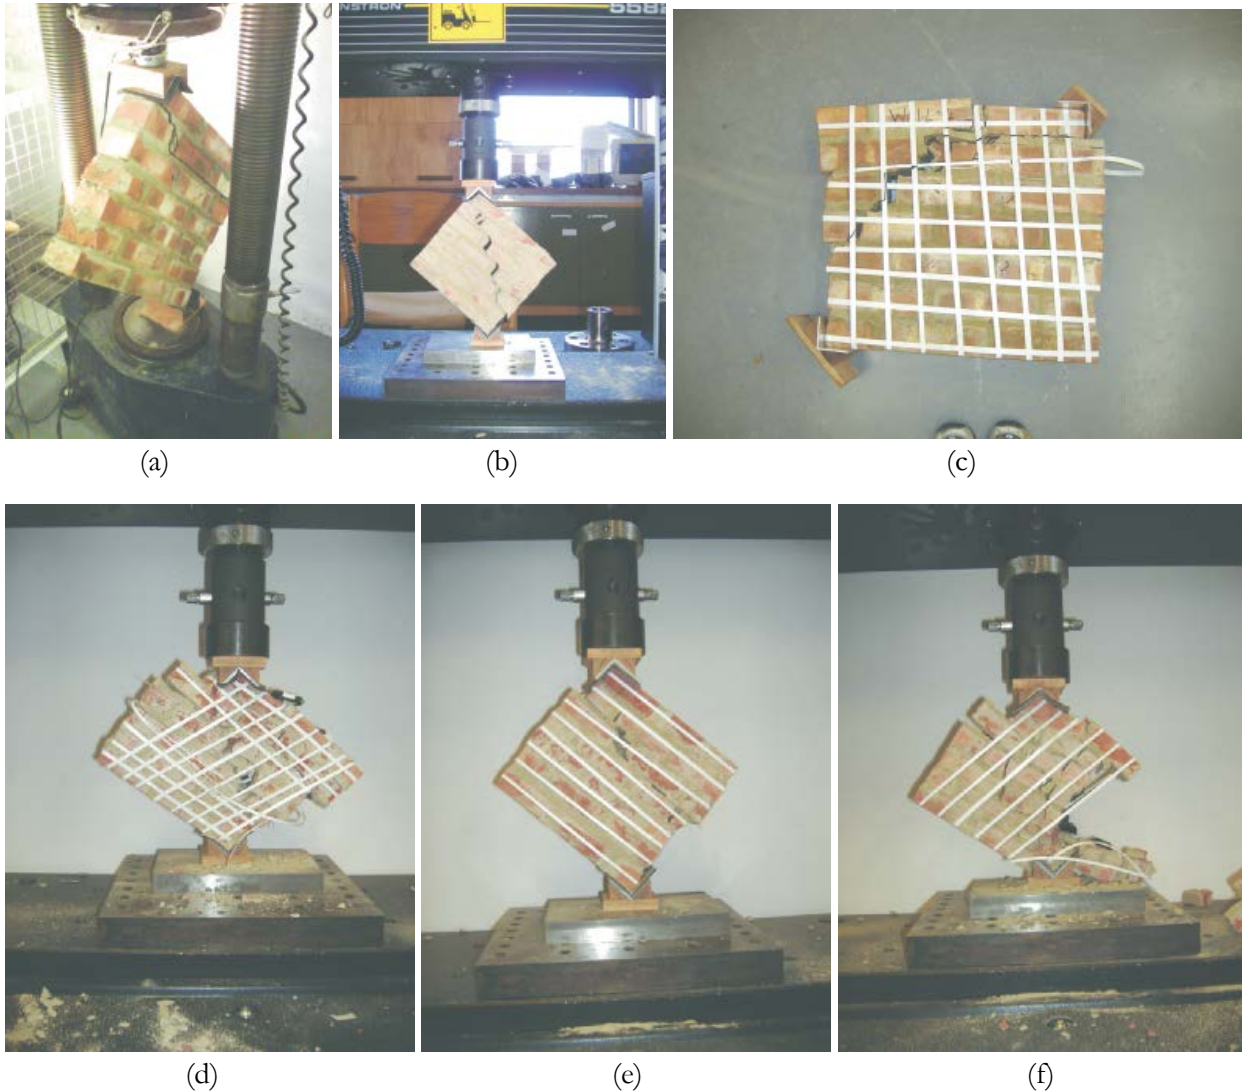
Full and small-scale model failures. (a) Full-scale specimen at brittle failure. (b) Small-scale specimen at brittle failure. (c) Full-scale specimen after testing. Note displacement and rotation of the corner section but maintained wall integrity. (d) Specimen continued to maintain load after second band failure. Further cracking suggests redistribution of load. (e) Intact sections suggest little redistribution of load. Total collapse observed after failure of the supporting band. (f) Load redistributing through specimen (shown by continued cracking) but little support offered by vertical bands. Note loss of debris
